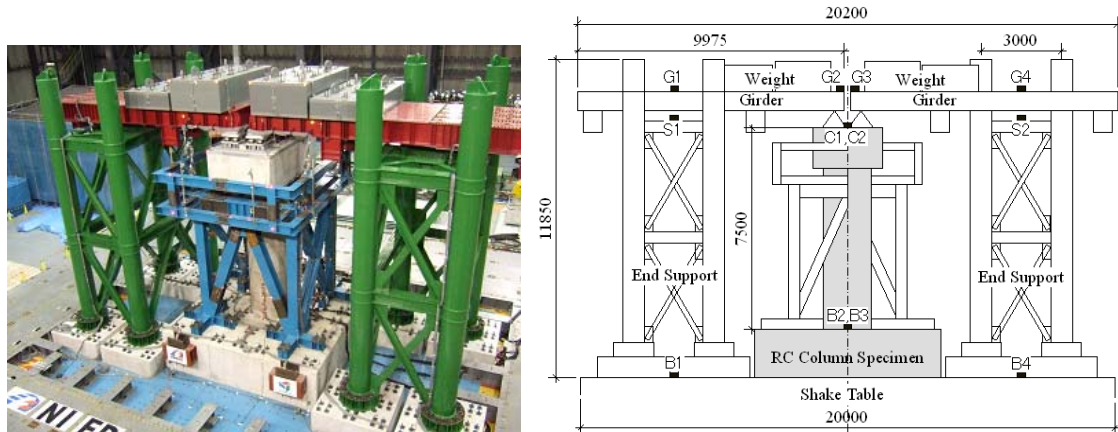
Full-scale bridge column specimens constructed for the E-Defense project.
